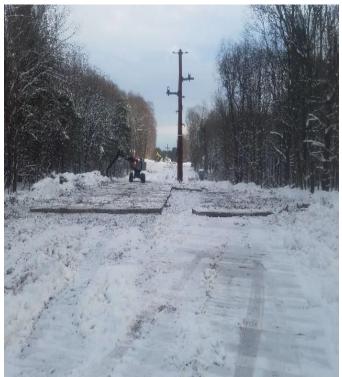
Building work pad around Str 107 for cable pulling activities. Viewing east. (12-04-19).
